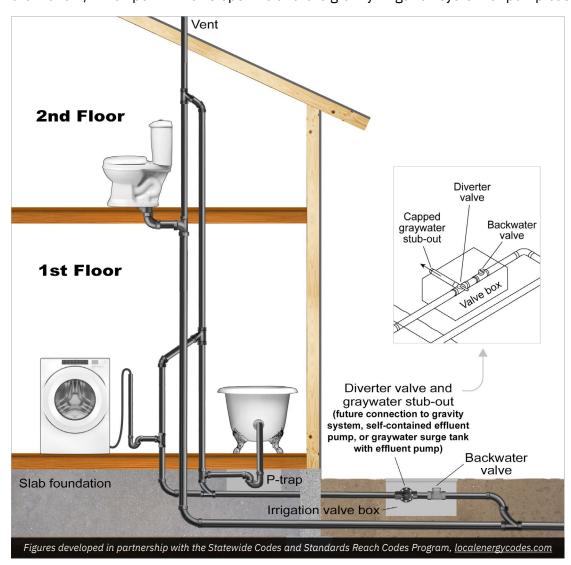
Dual Drainage Plumbing: Multiple fixtures on concrete slab foundation
